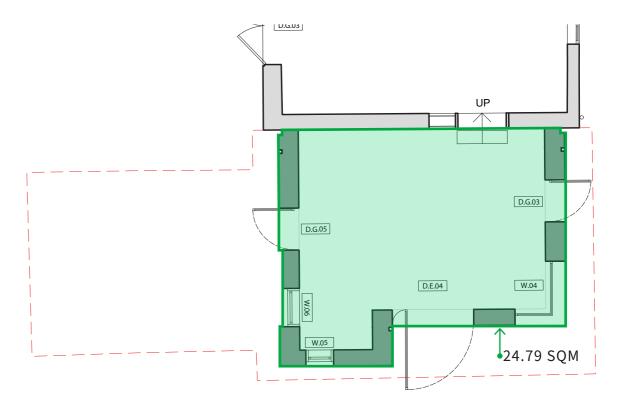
Proposed extension ground floor footprint (24.79 sqm)
